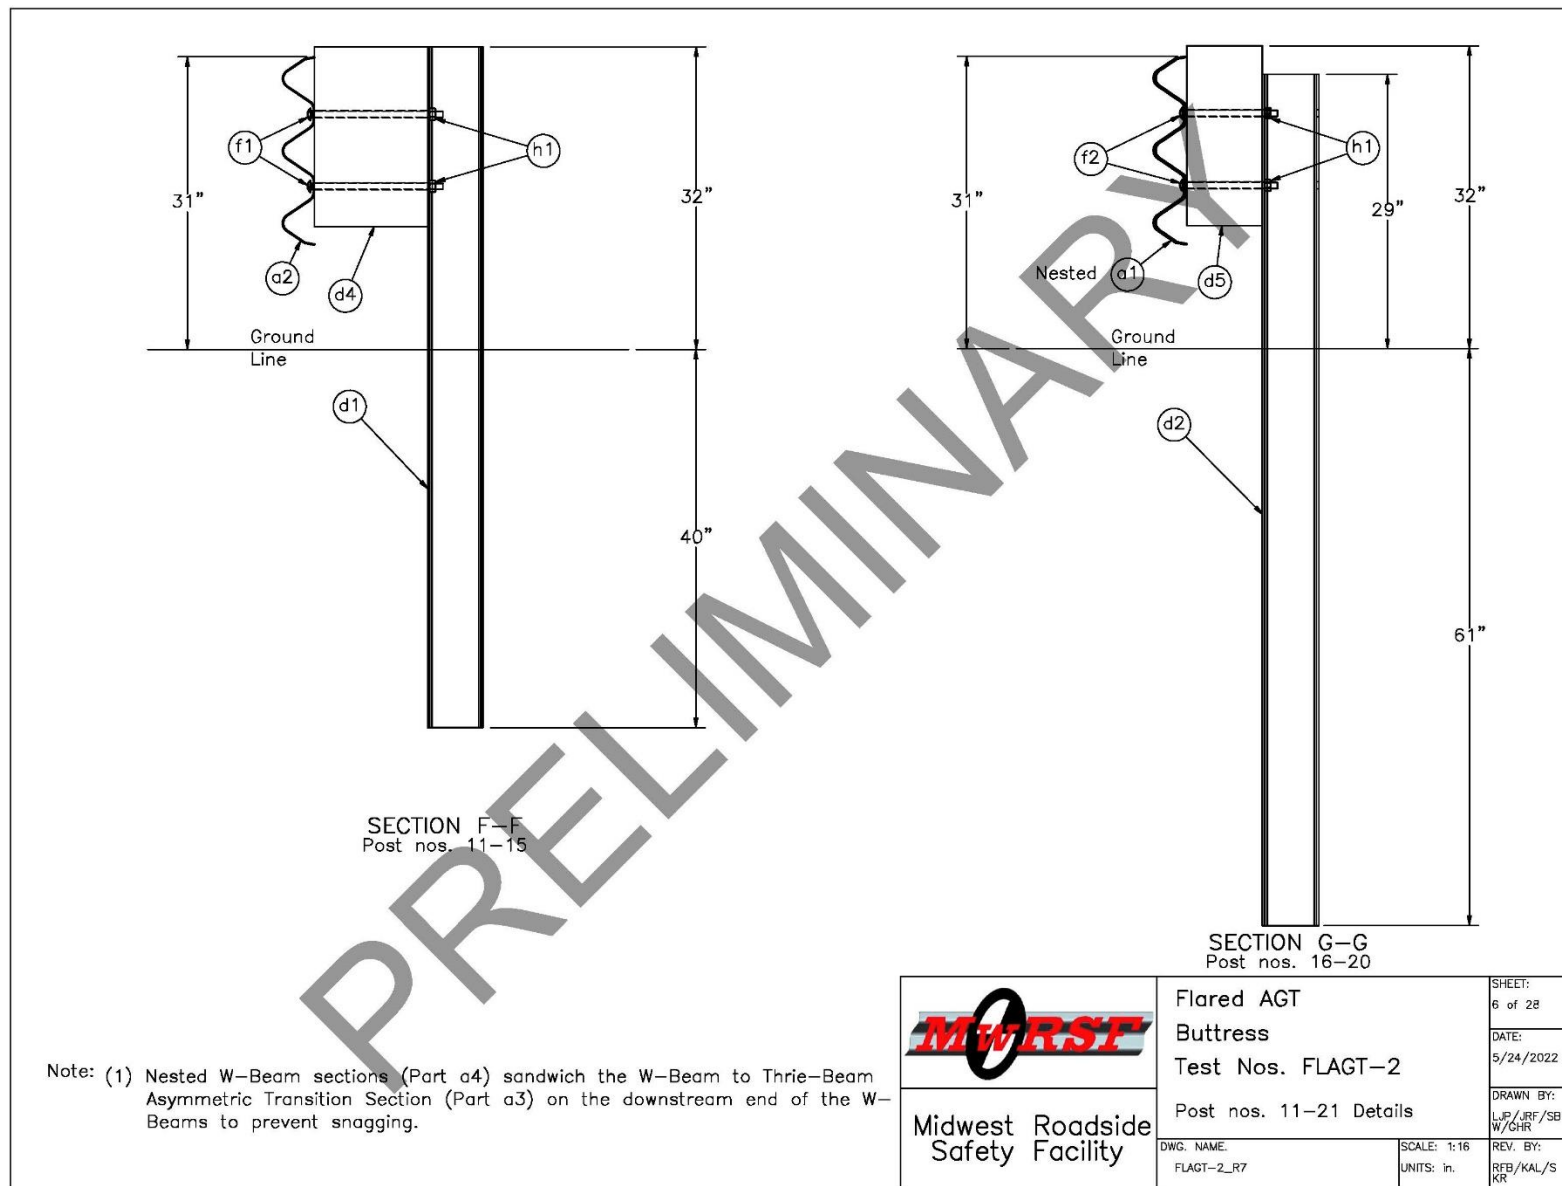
Post Nos. 11 through 20 Details, Test No. FLAGT-2
